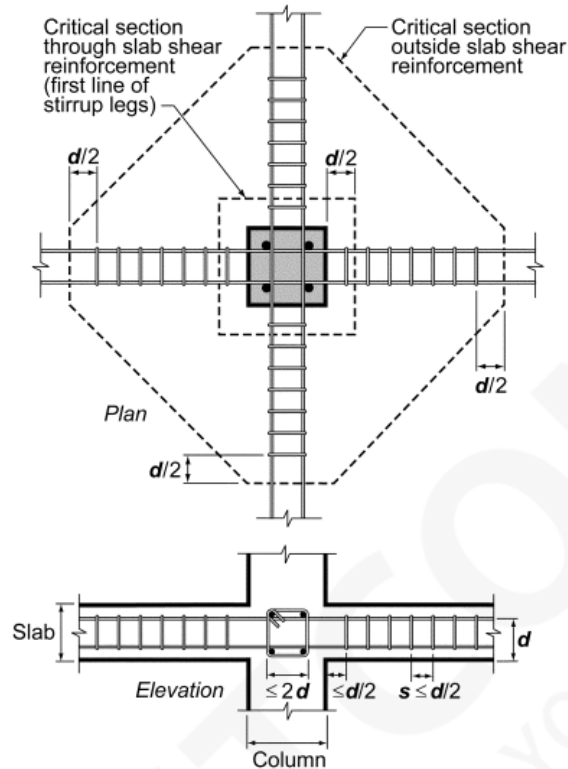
(d)—Arrangement of stirrup shear reinforcement, interior column.
